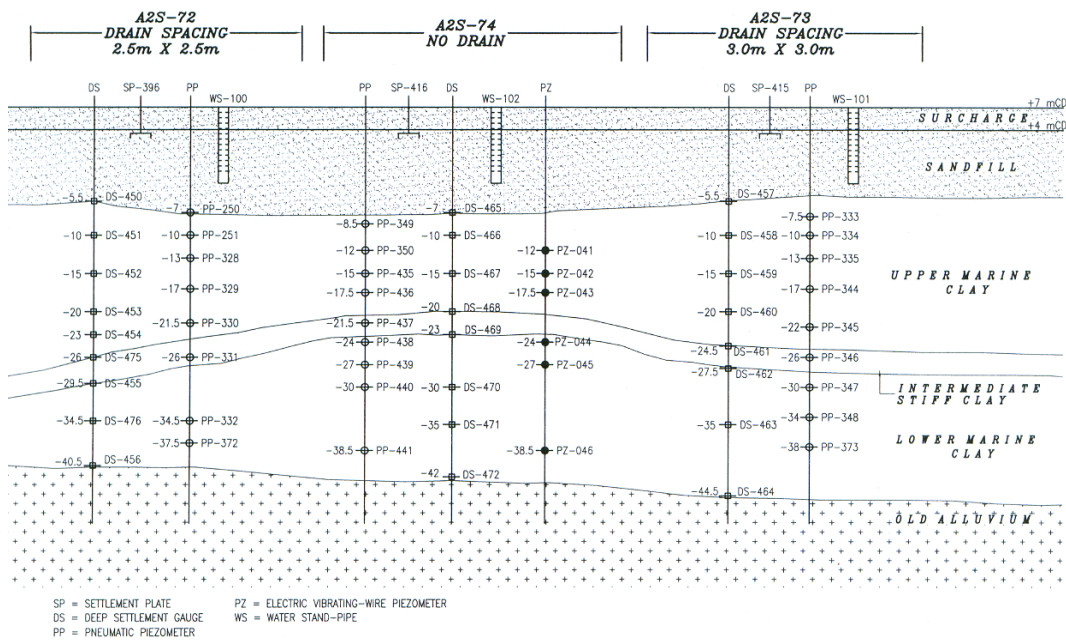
Cross sectional profile showing instrument elevations at the Pilot Test Site (Arulrajah et al., 2004e).
